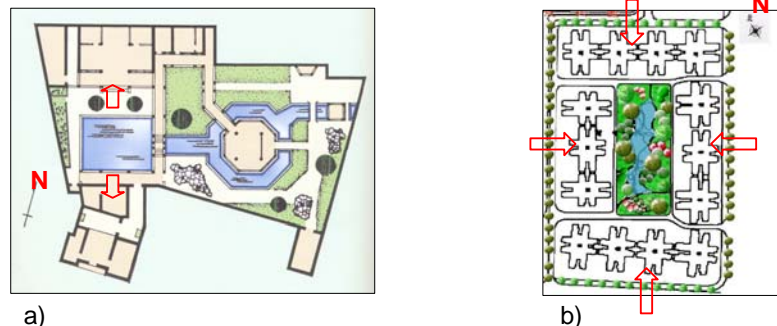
Garden layout plan of a)Yuyin Garden and b)Kang Garden
